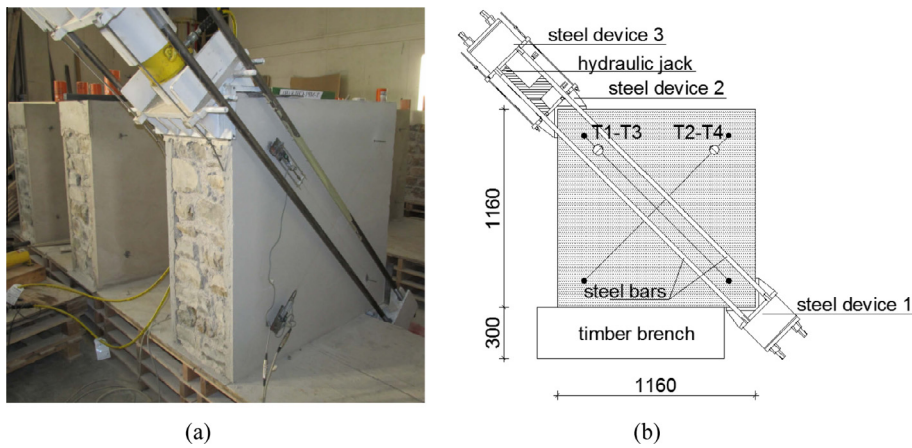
Picture (a) and drawing (b) of the experimental apparatus for diagonal compression tests mounted on a specimen.
